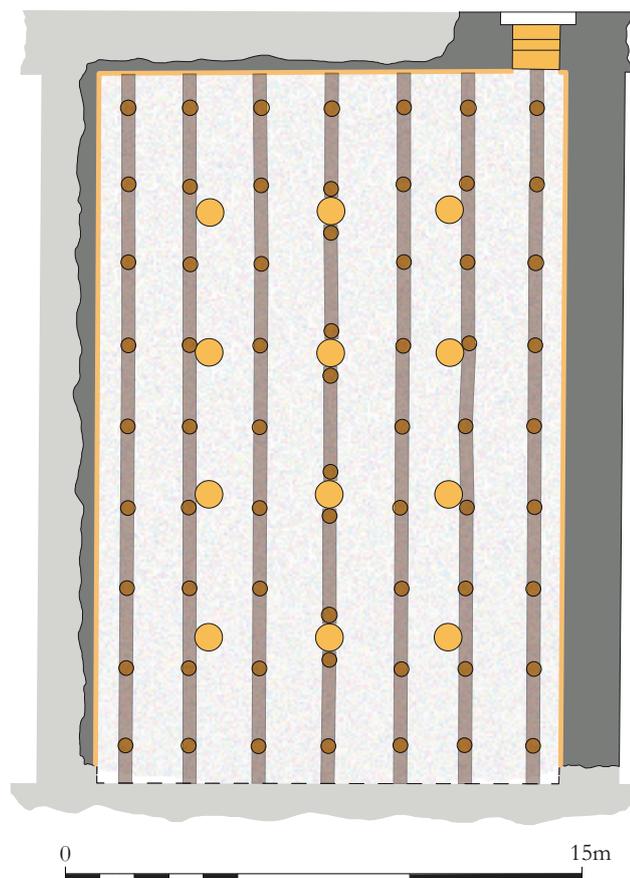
Sanam Abu Dom. Chamber 6 in the Treasury, suggested arrangement of timber girders to support the joists of the raised floor - scale 1:200 (base plan: after Griffith 1922, pl. L).
